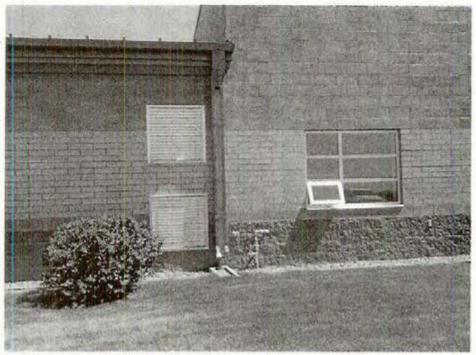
IFR exhaust vents located approximately 4 feet from the open windows of the exercise room.
